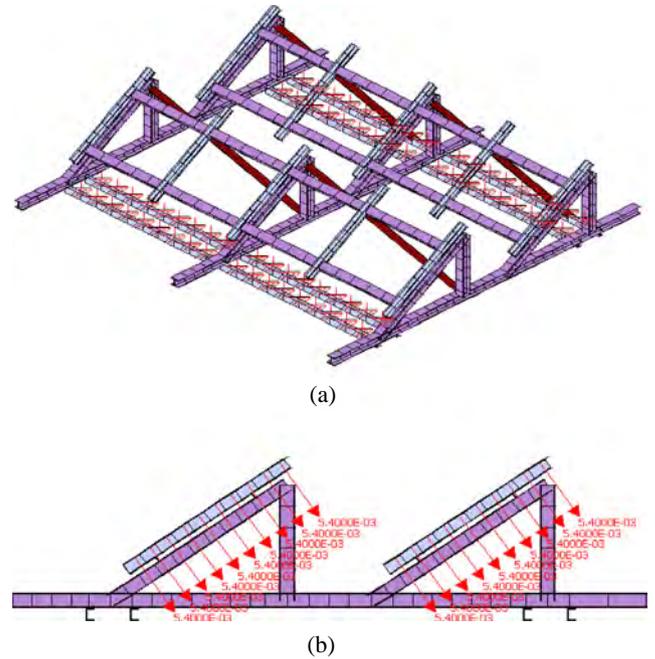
Boundary and loading conditions. (a) Boundary conditions (all hinges) and (b) loading conditions.
